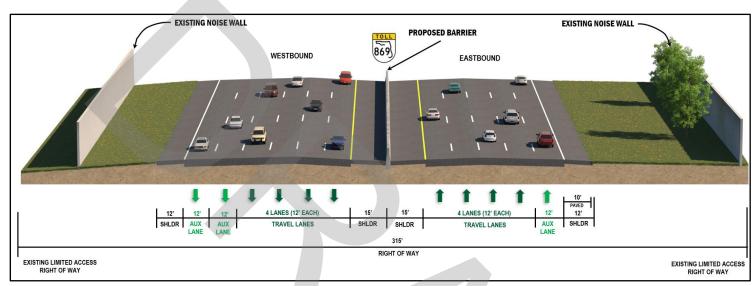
Preferred Alternative Roadway Section West of US 441
